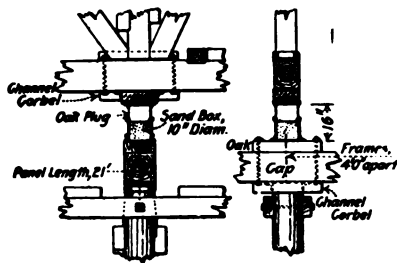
Details of Sand Box, Gruenwald Bridge Center.
